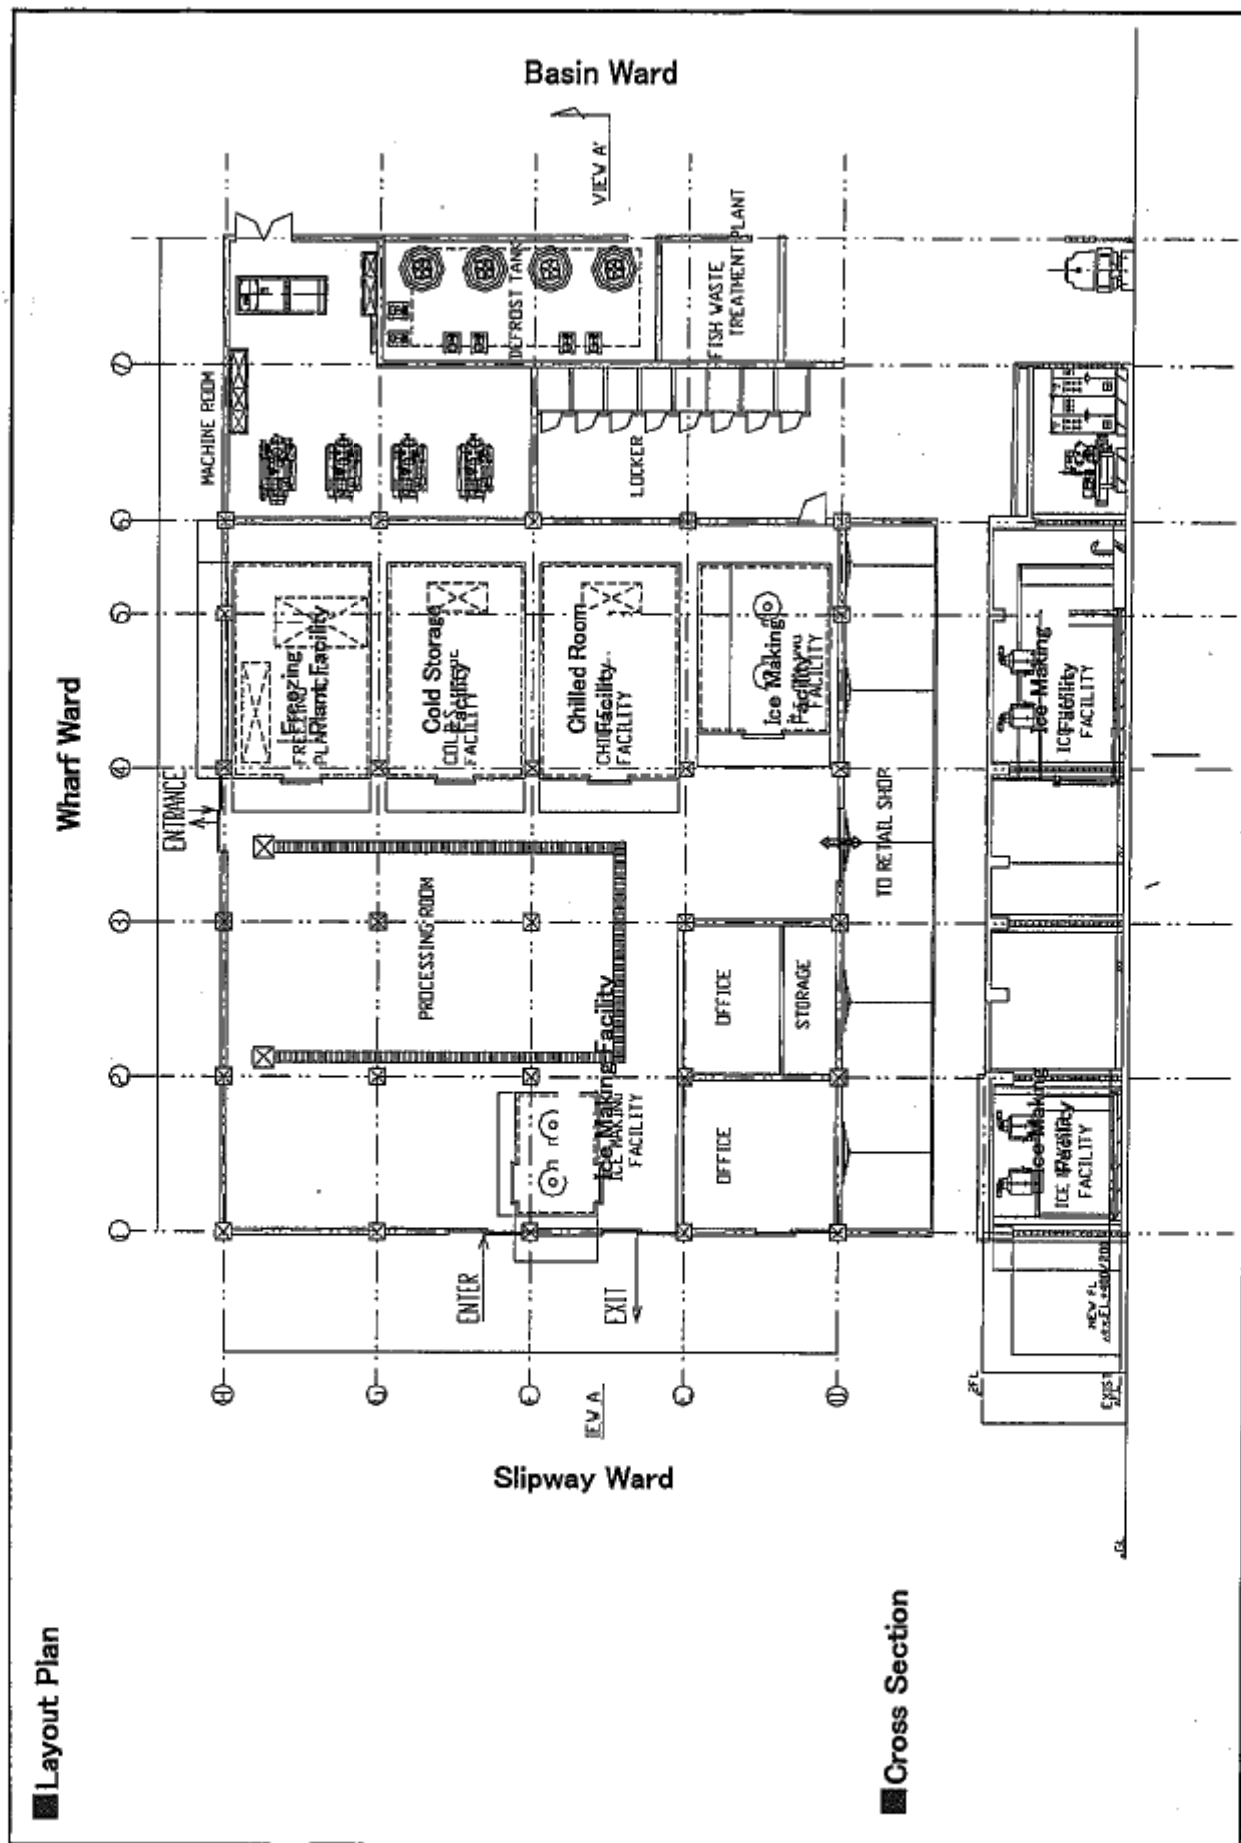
(4) Restoration Plan and Cross Section of Fisheries Center, Ground Floor
